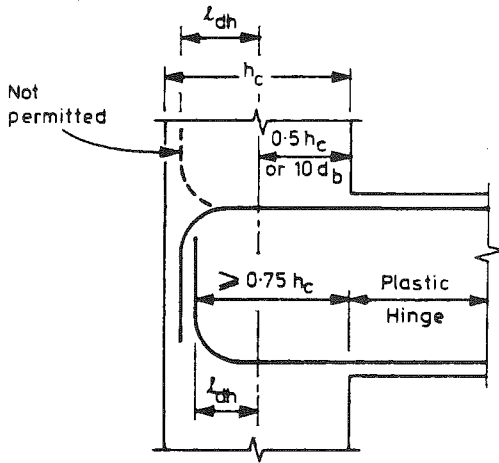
Anchorage of Beam Bars When Critical Section of Plastic Hinge Forms at Column Face [5].
